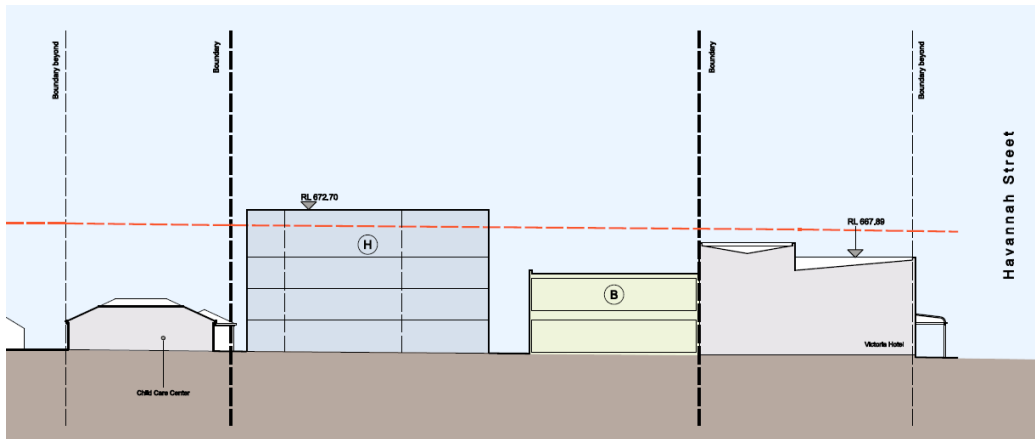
Cross section indicating areas not developed below height control (Source: Karl Walls Design)
